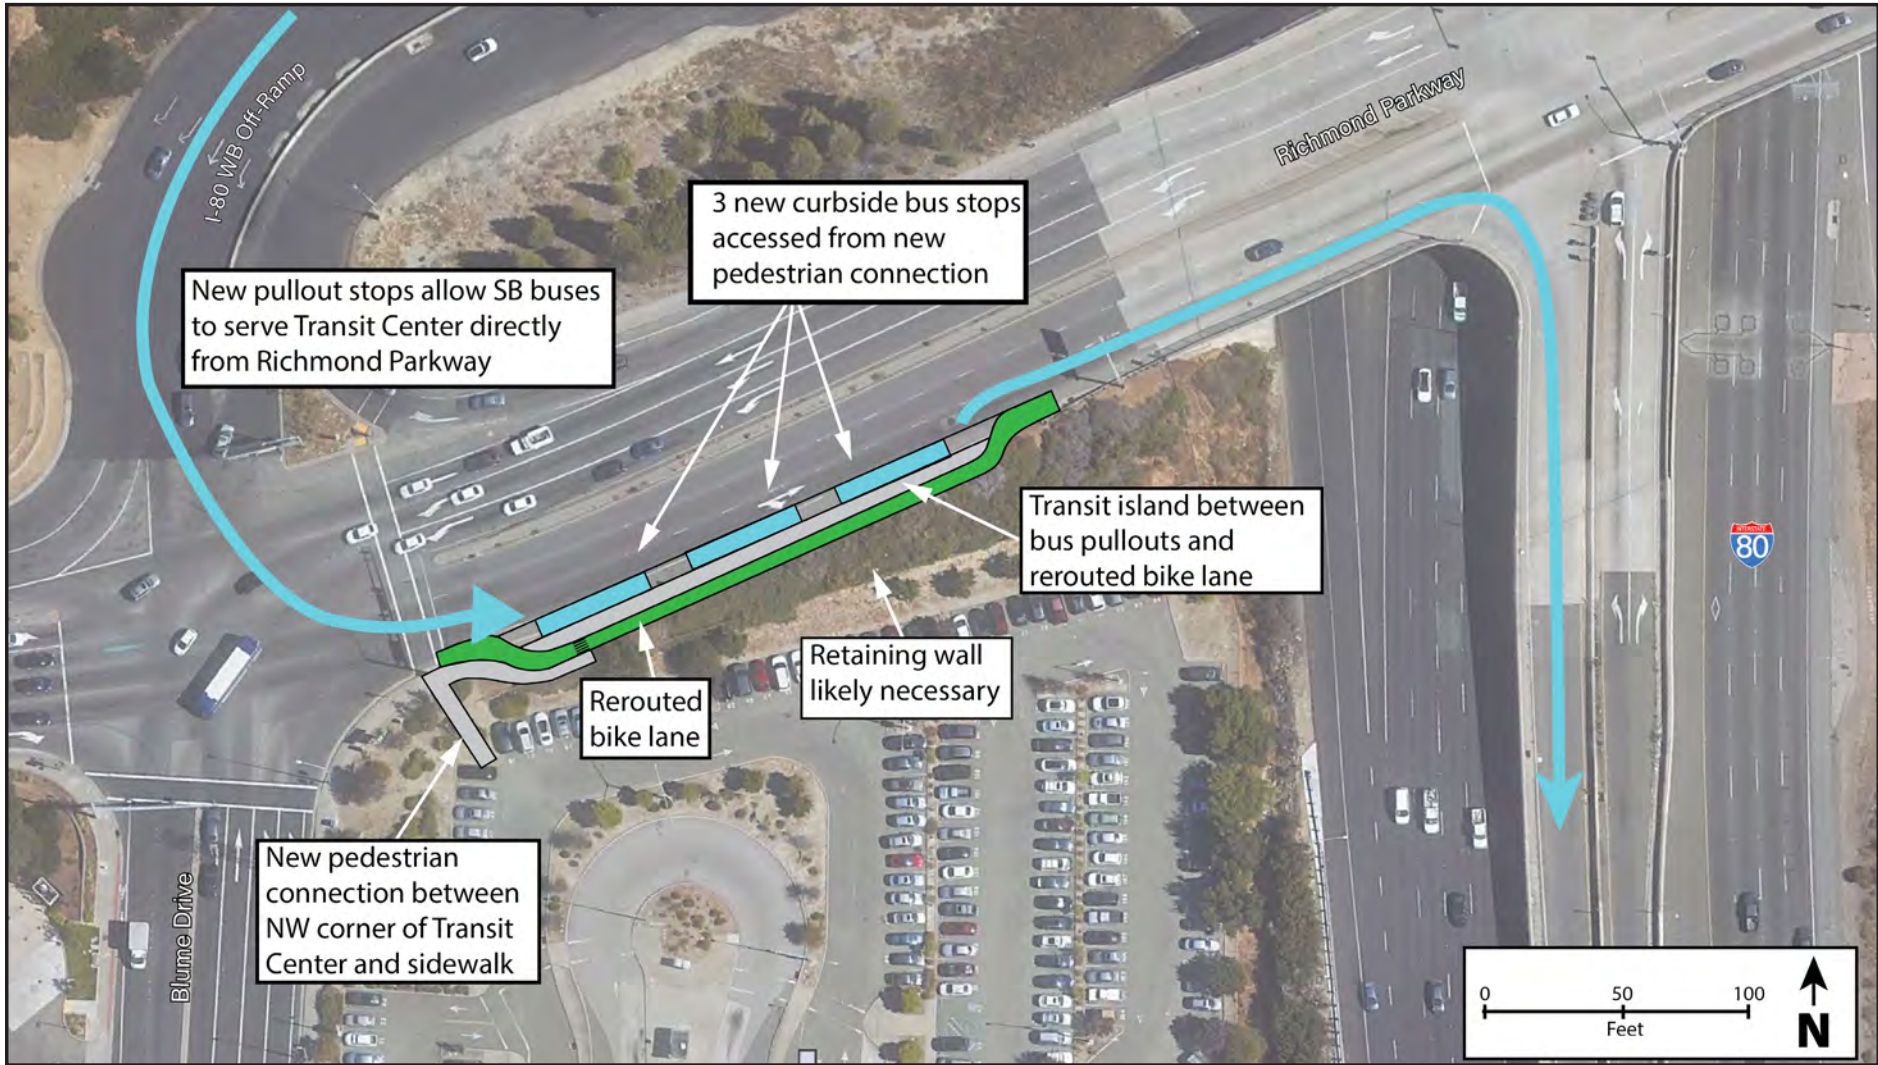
Proposed Richmond Parkway Transit Center Access Enhancement (TC2-I)
